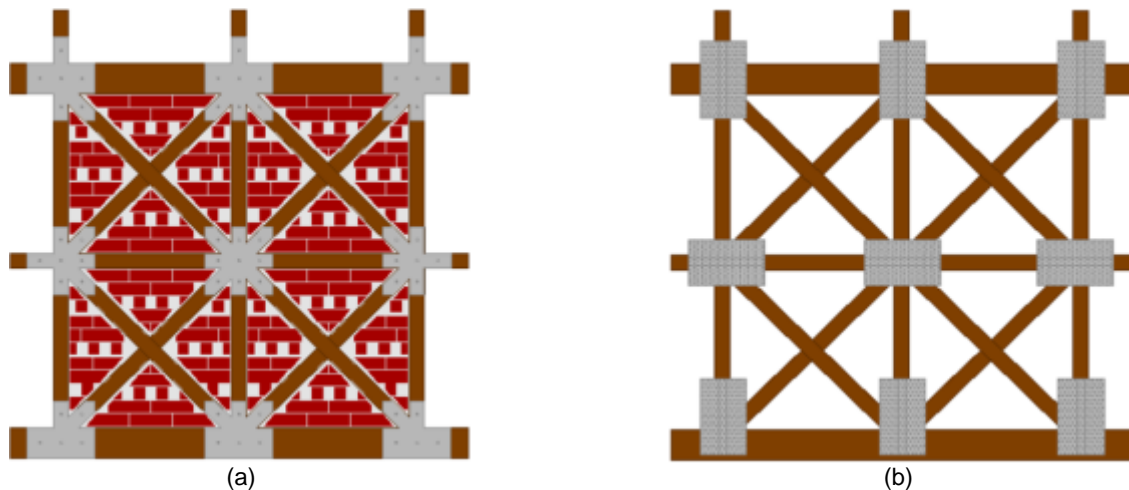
Strengthening with steel plates: (a) custom plates for timber frame walls with masonry infill; (b) commercial plates for timber frame walls without infill
